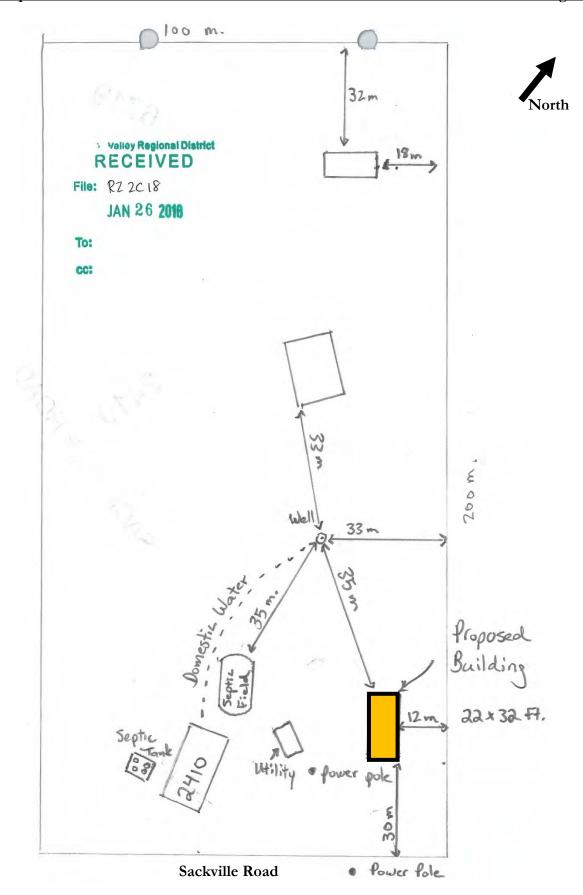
Proposed Site Plan if Rezoning were to be Successful
